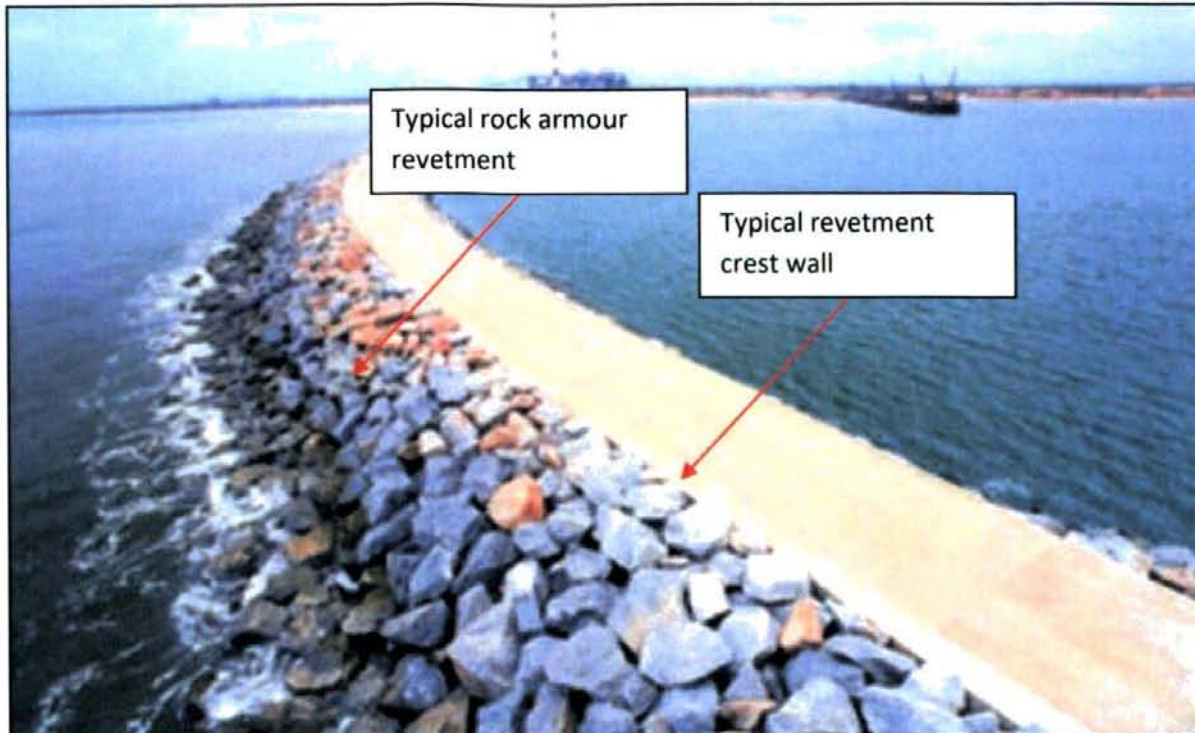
Example breakwater showing rock armour revetment and crest wall. Similar in construction to the proposed perimeter embankment.
